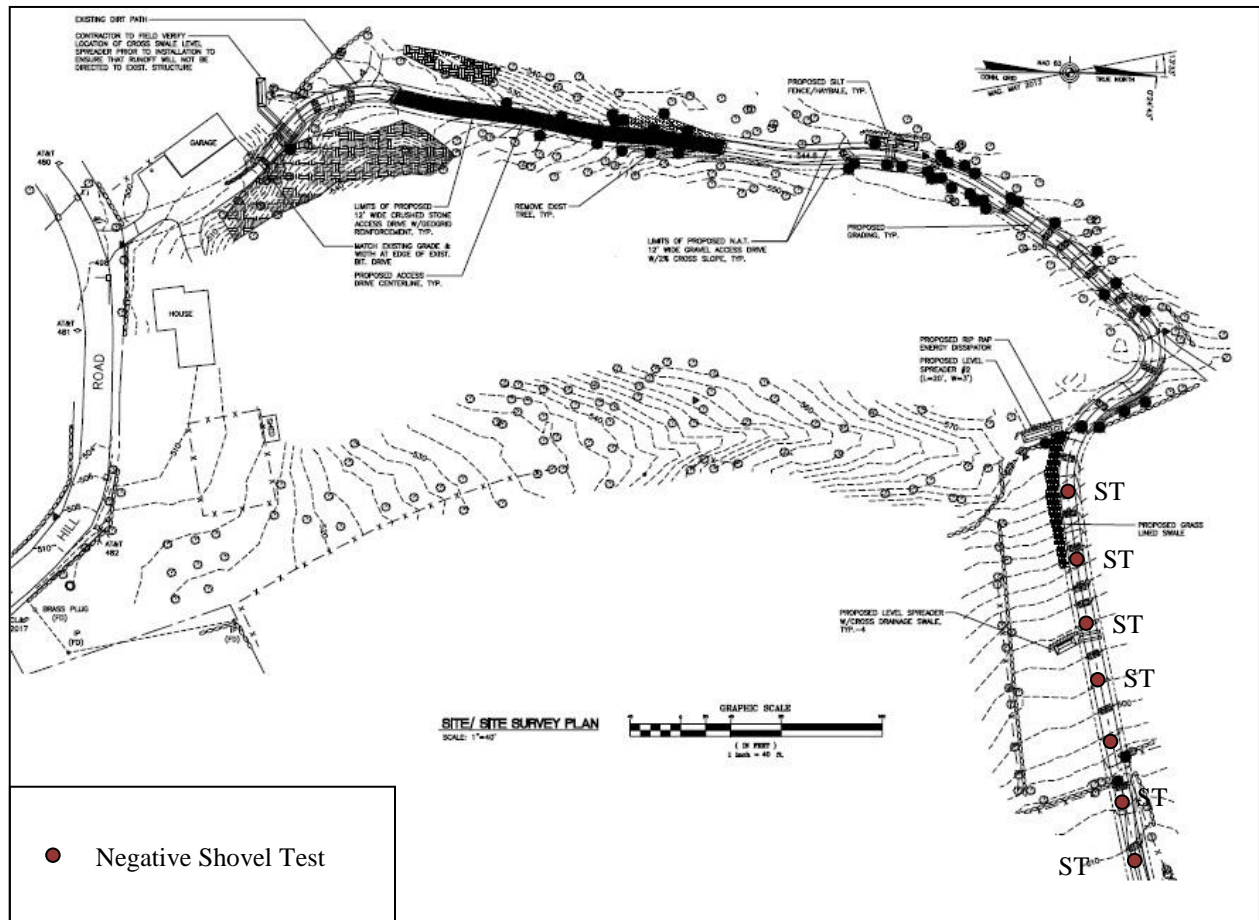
Plan view of proposed lease area and access road associated with Alternates 1 and 2 (locations of shovel tests excavated along the access road and previously disturbed areas noted on plan view).
